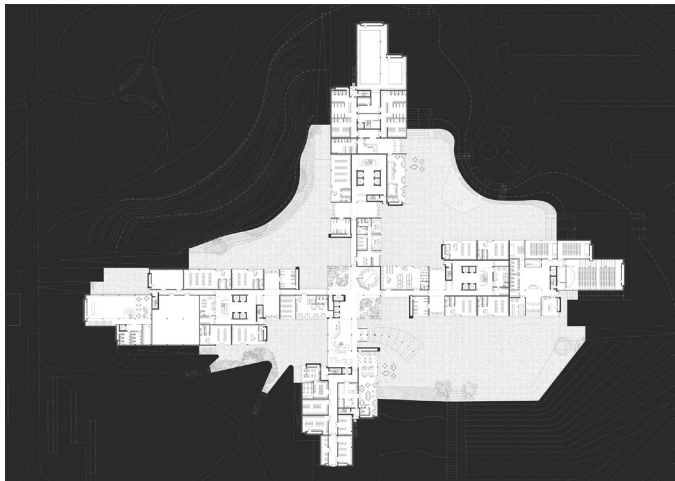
Ground floor, previously underground/level -1 (Tafaro & Farahbod 2025).
